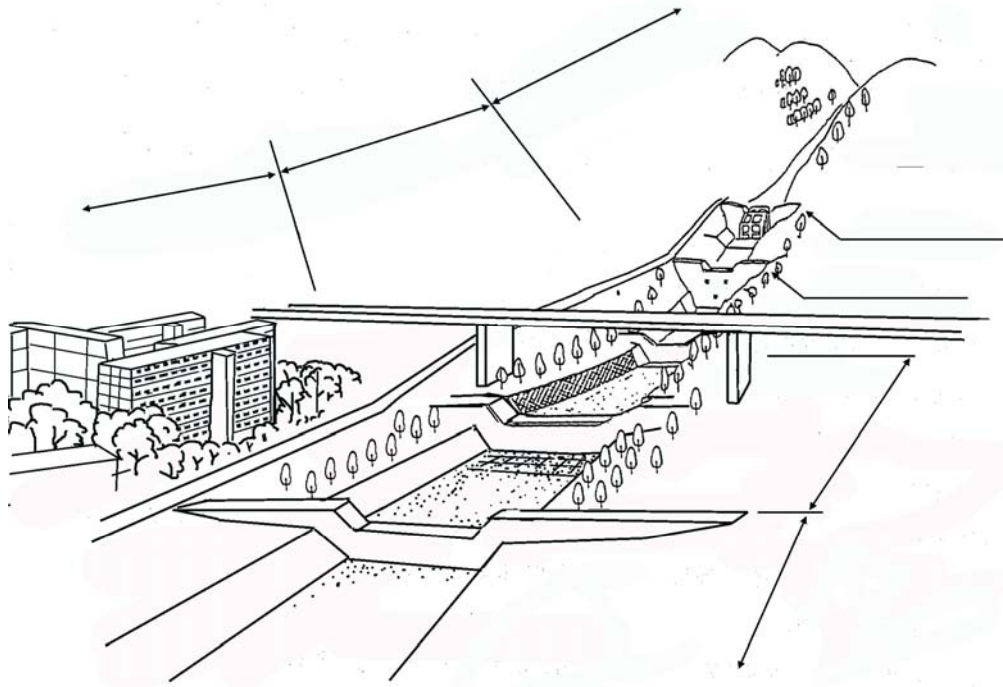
Illustration of Typical Sabo Dam Layout
